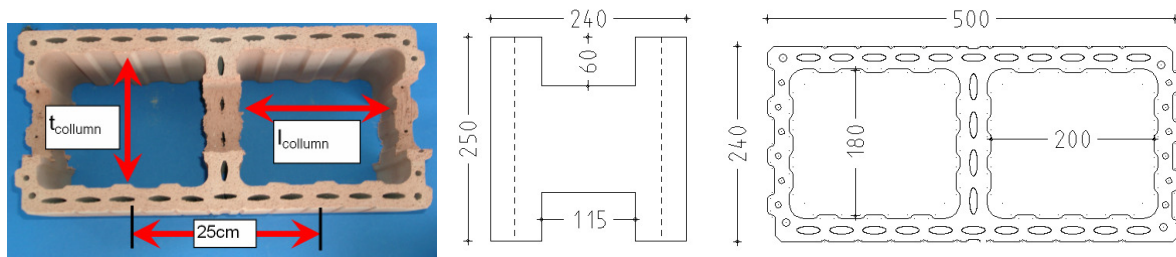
Detailed view on the hollow clay unit and dimensions of the concrete infill
